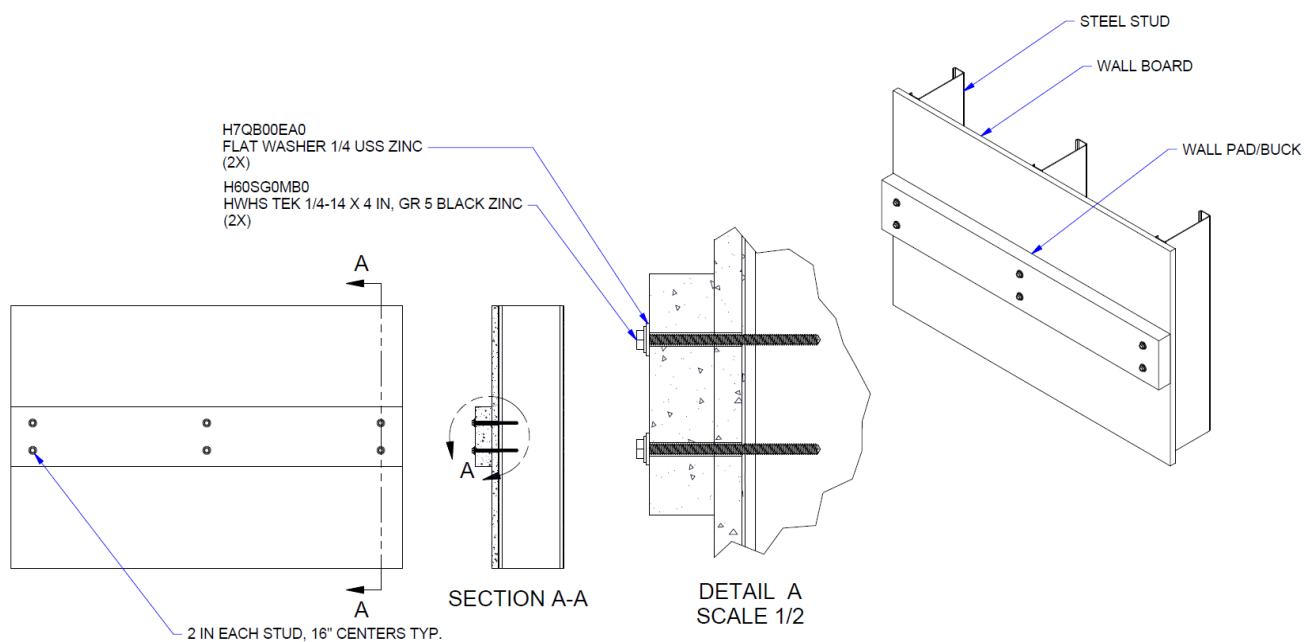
Wall Buck/Pad Concrete Wall Attachment (3' Wall Pad Shown)
